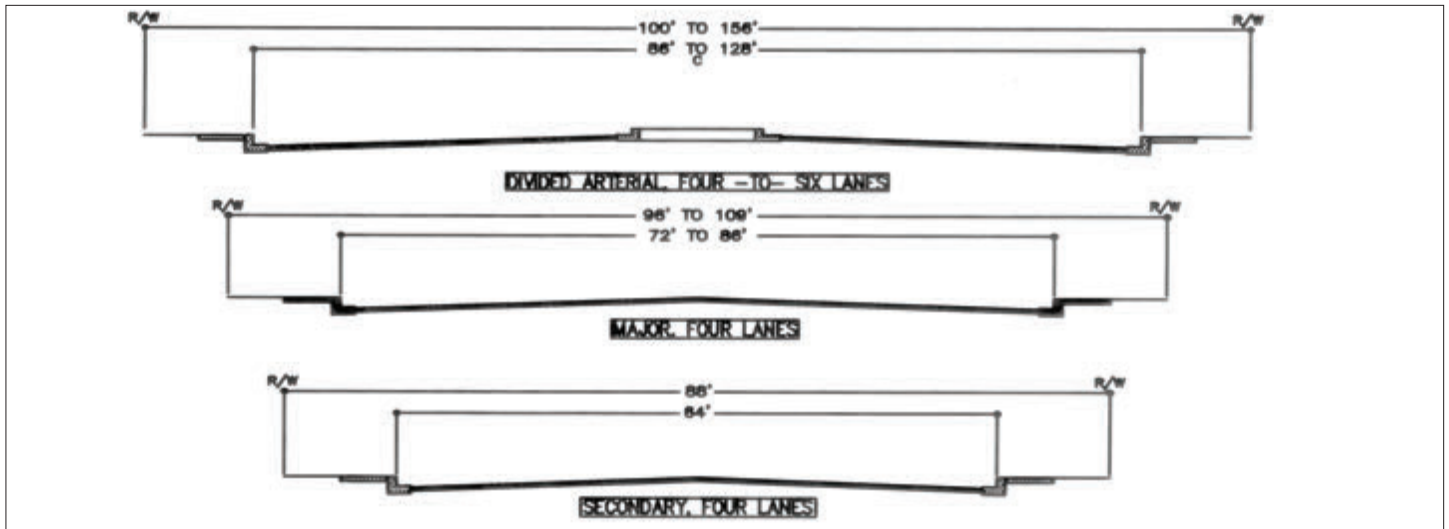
GENERAL PLAN TYPICAL CROSS SECTIONS
